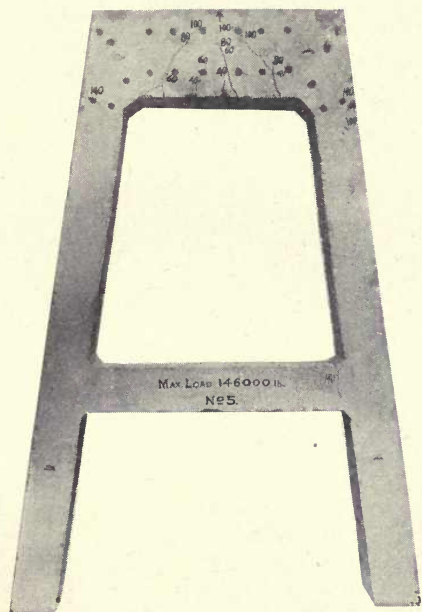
VIEW OF FRAME 5 AFTER TEST
